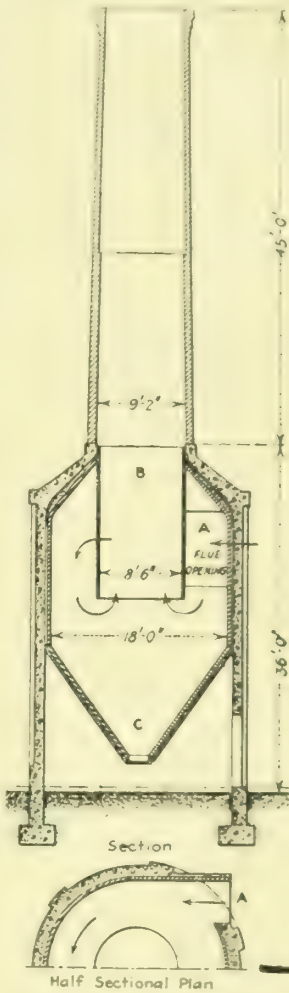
STACK AND CINDER COLLECTING CHAMBER.
